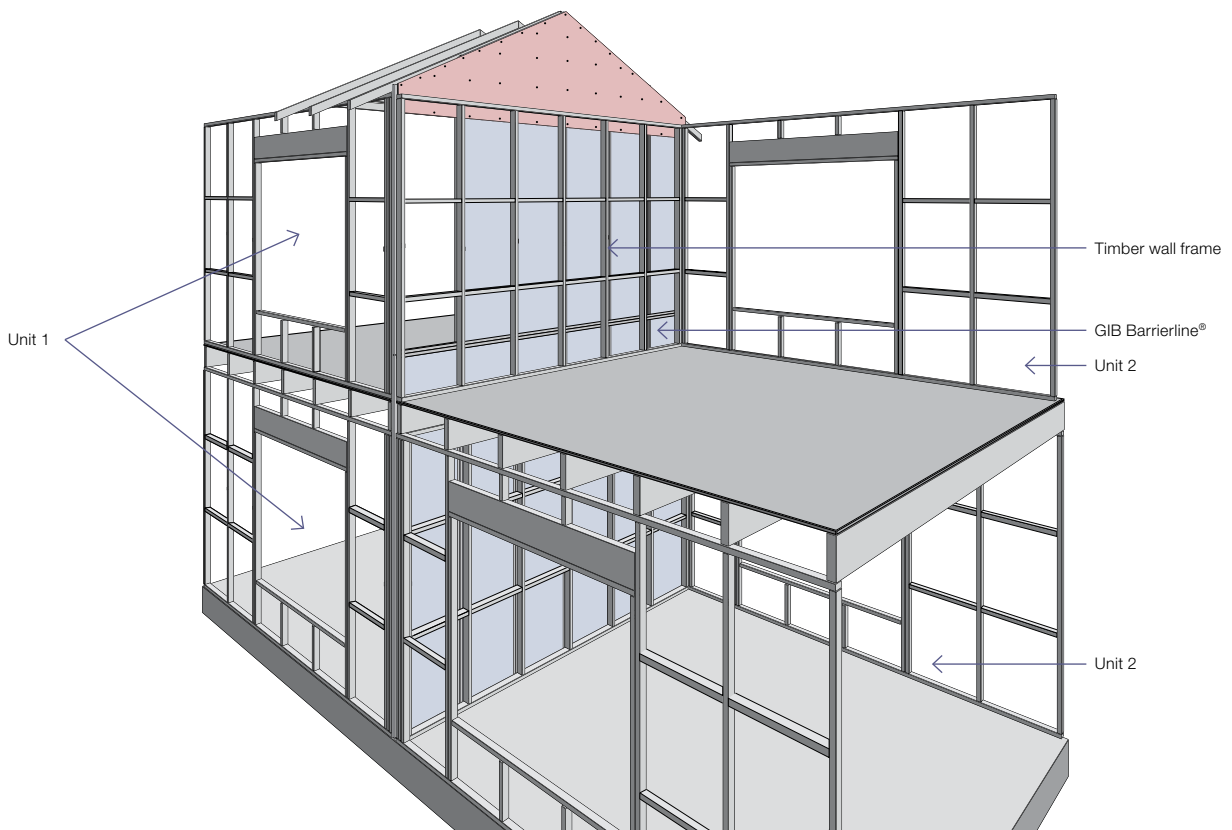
STEP 4 - UNIT 2 FIRST FLOOR FRAMING INSTALLED
